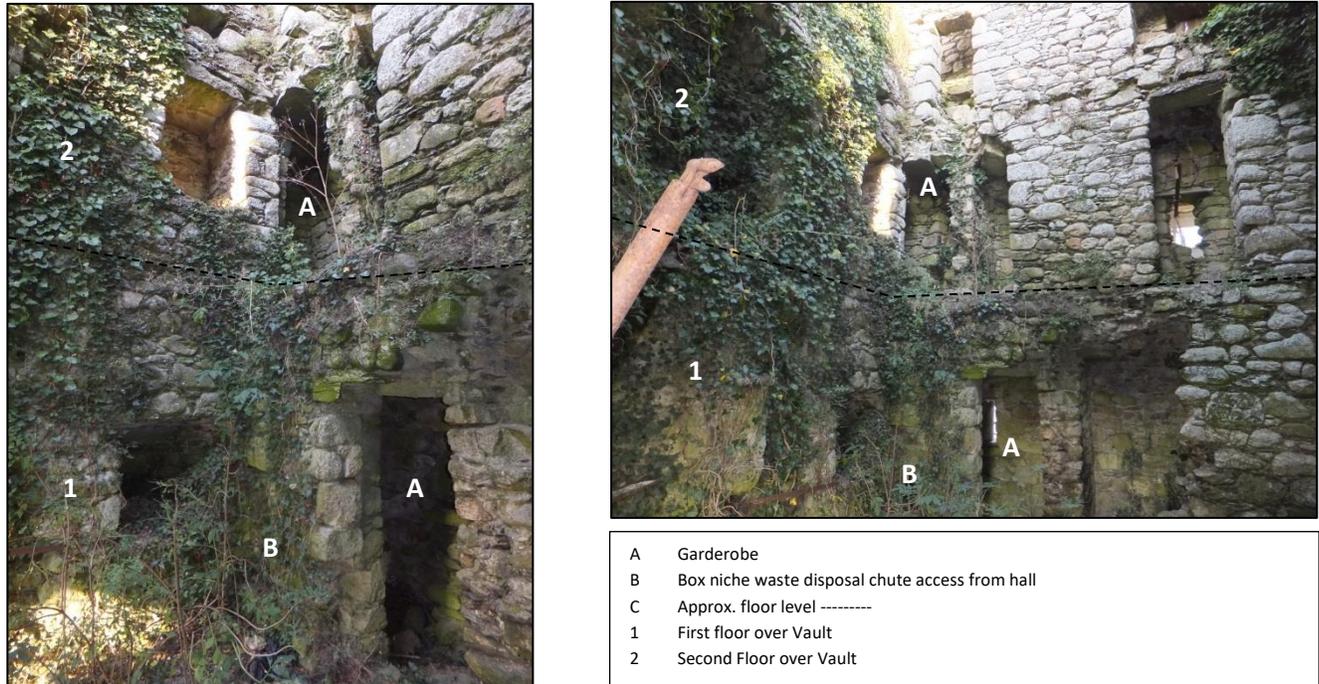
1st & 2nd Floor over Vault. Looking NE/E.
